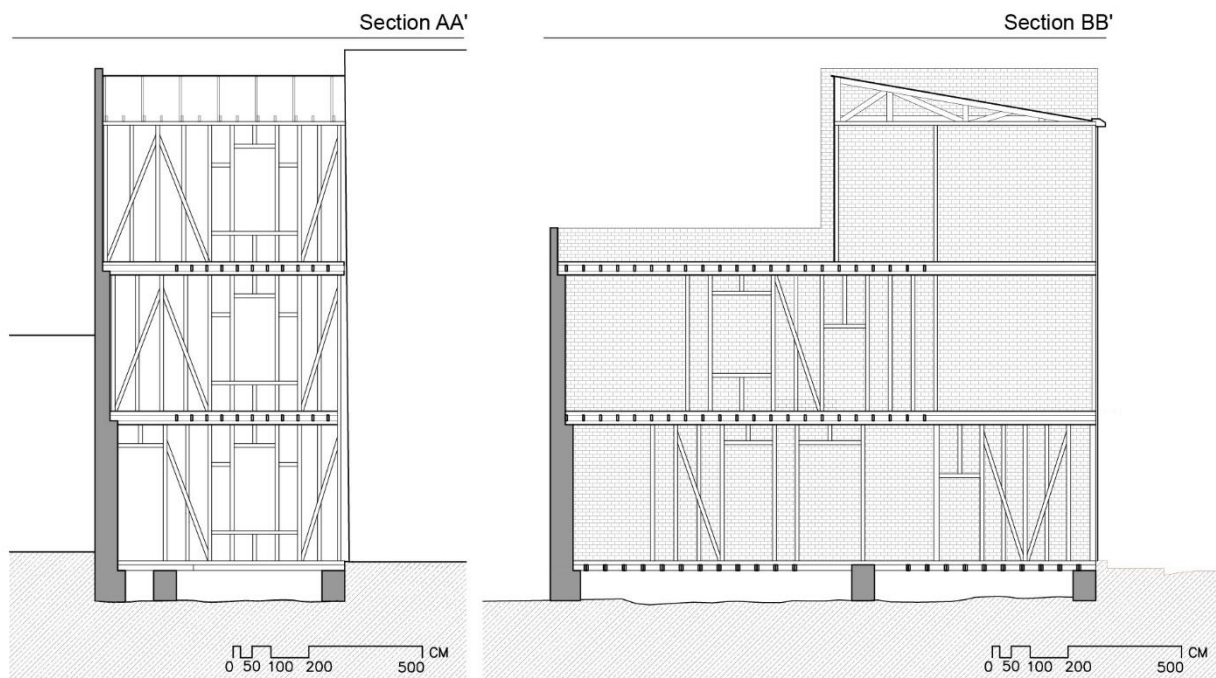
Sections AA and BB of Building 1, as reported in the drawings of Figure 6-3.
